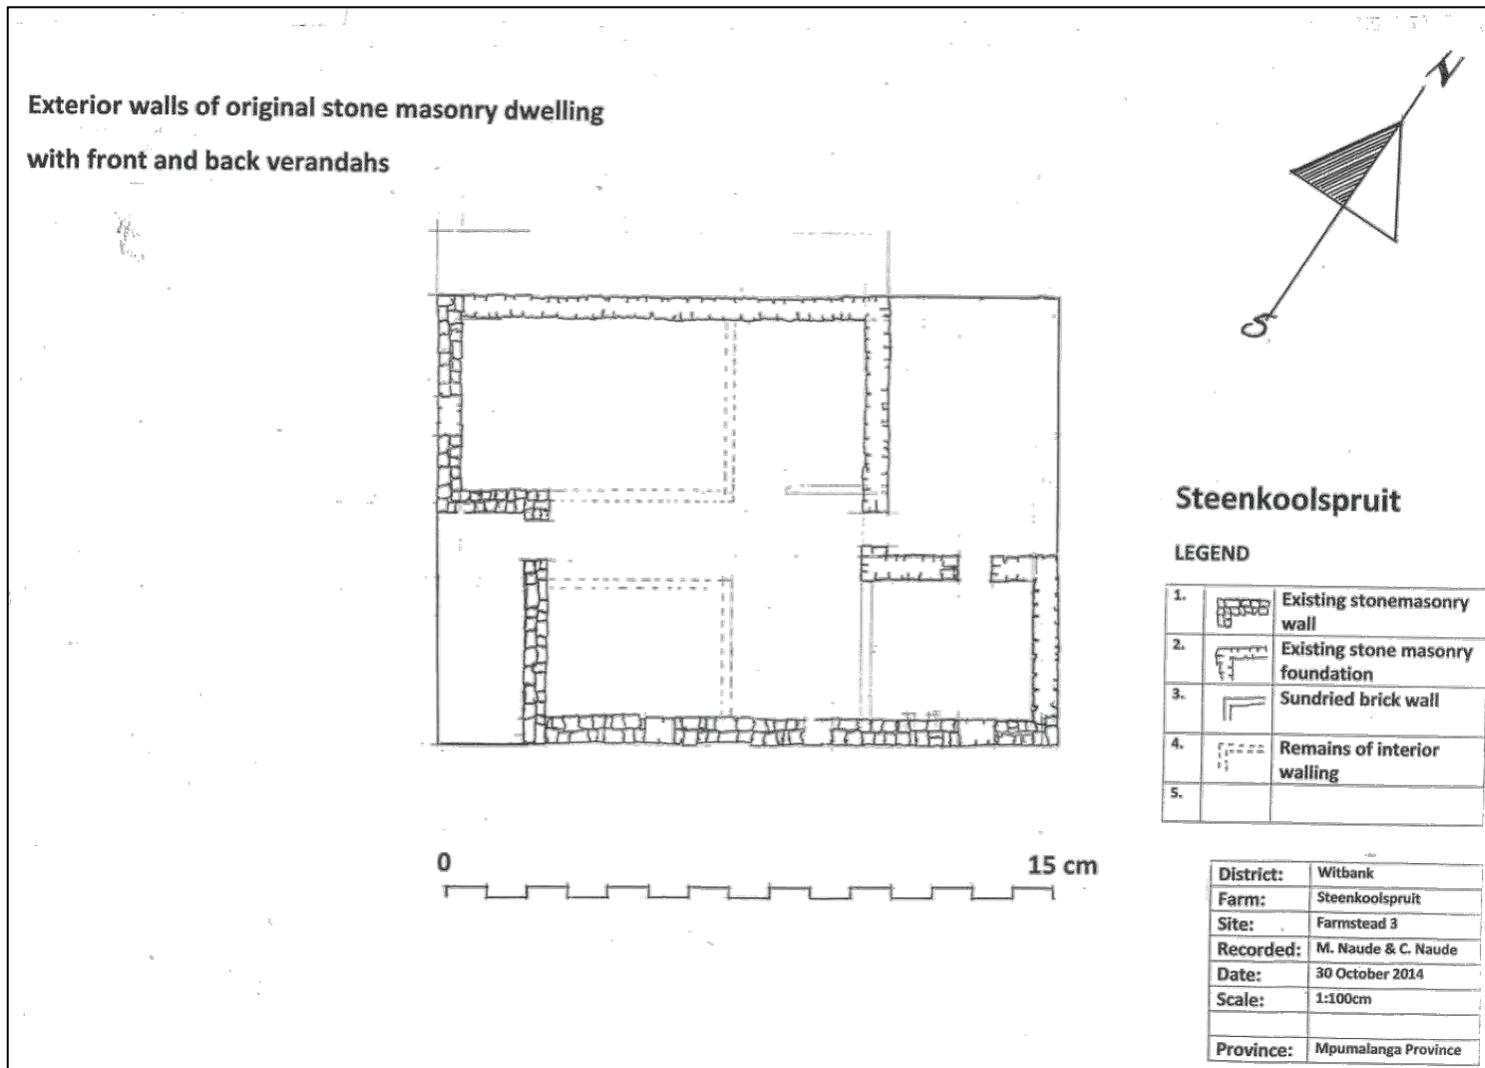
A floor plan of the original dwelling showing the exterior stone masonry walls. As most of the sundried brick walls have disappeared, the interior division of spaces is hypothetical. Drawing appeared in the recording report of Mauritz Naudé (2014:4).
